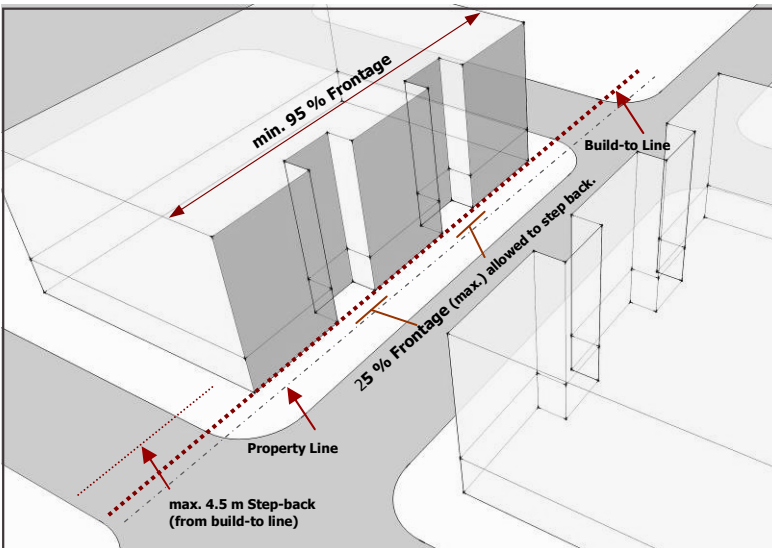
Illustration of a building streetwall positioned on 'A' Frontages
